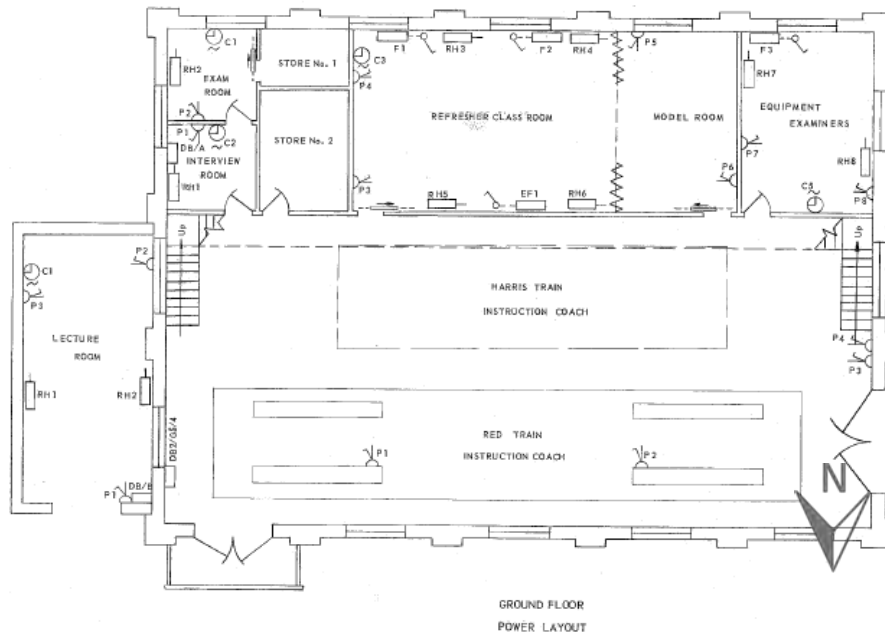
Plan of ground floor (power layout), showing later lecture theatre to east (since removed) and instruction coaches, dated 1977. (Source: PTV Drawing Management System)
